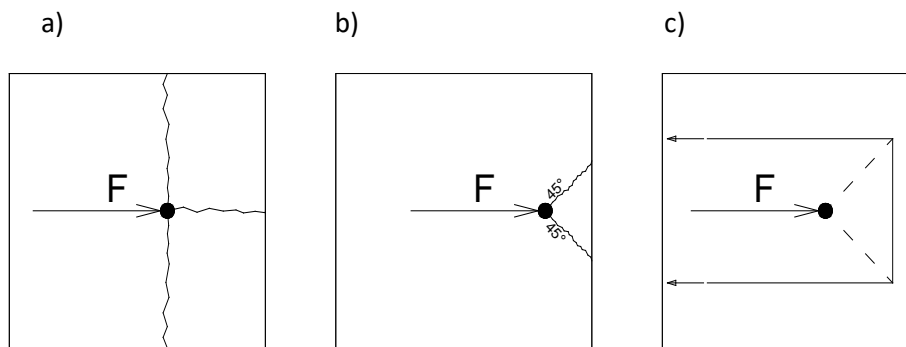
Splitting failure of the concrete, a) potential splitting plane when the dowel is located further deep into the section of the element, b) splitting plane when the dowel is located close to the edge of the element, and c) strut and tie method of force transfer [Ref.:035].
